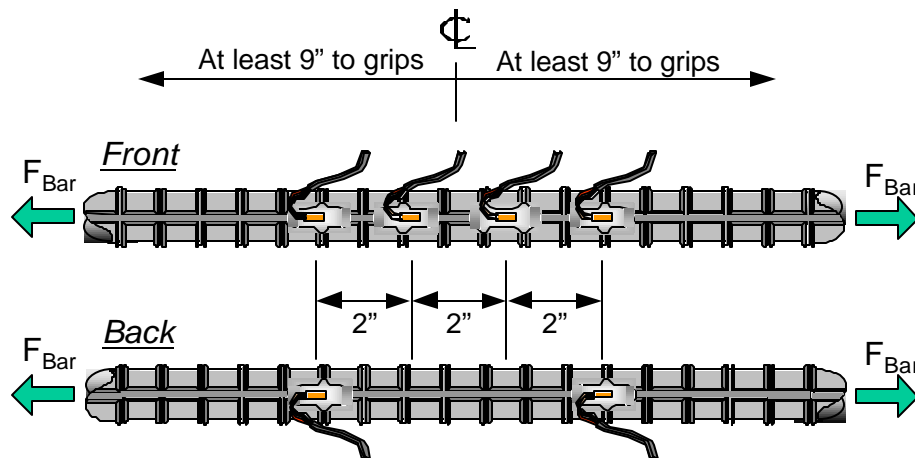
Layout of strain gages for #8 and #11 tensile specimens
